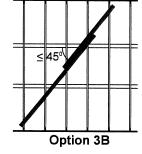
Diagonal Bracing for 1 Row of CLRs
